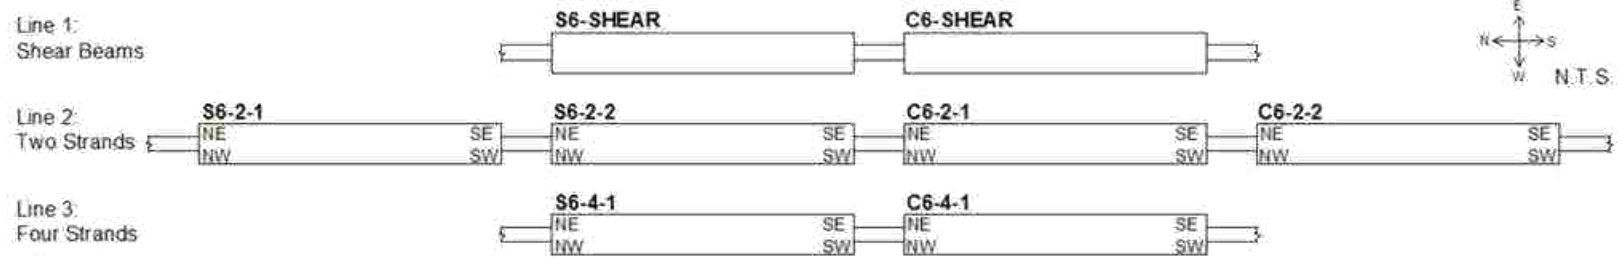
C6 and S6 Prestressing Bed Layout
